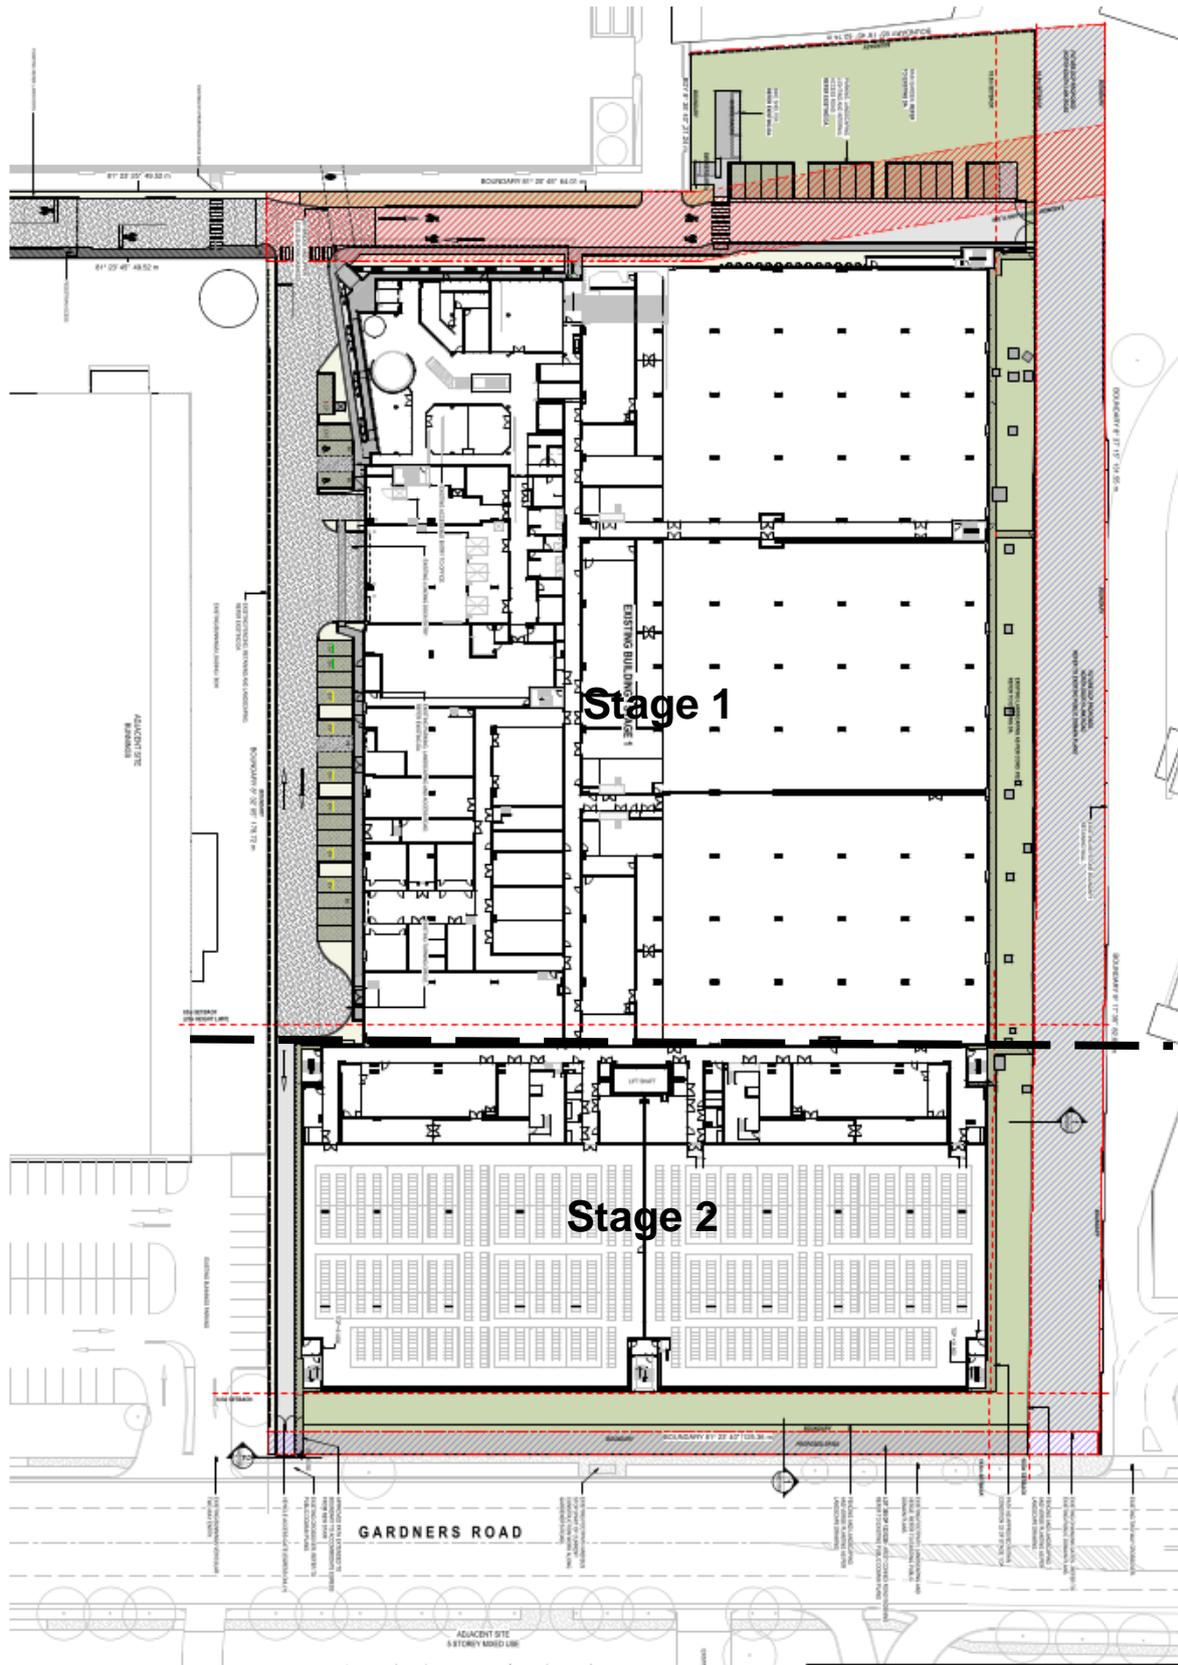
Proposed site plan for stage 2 as labelled and below the dashed black line
